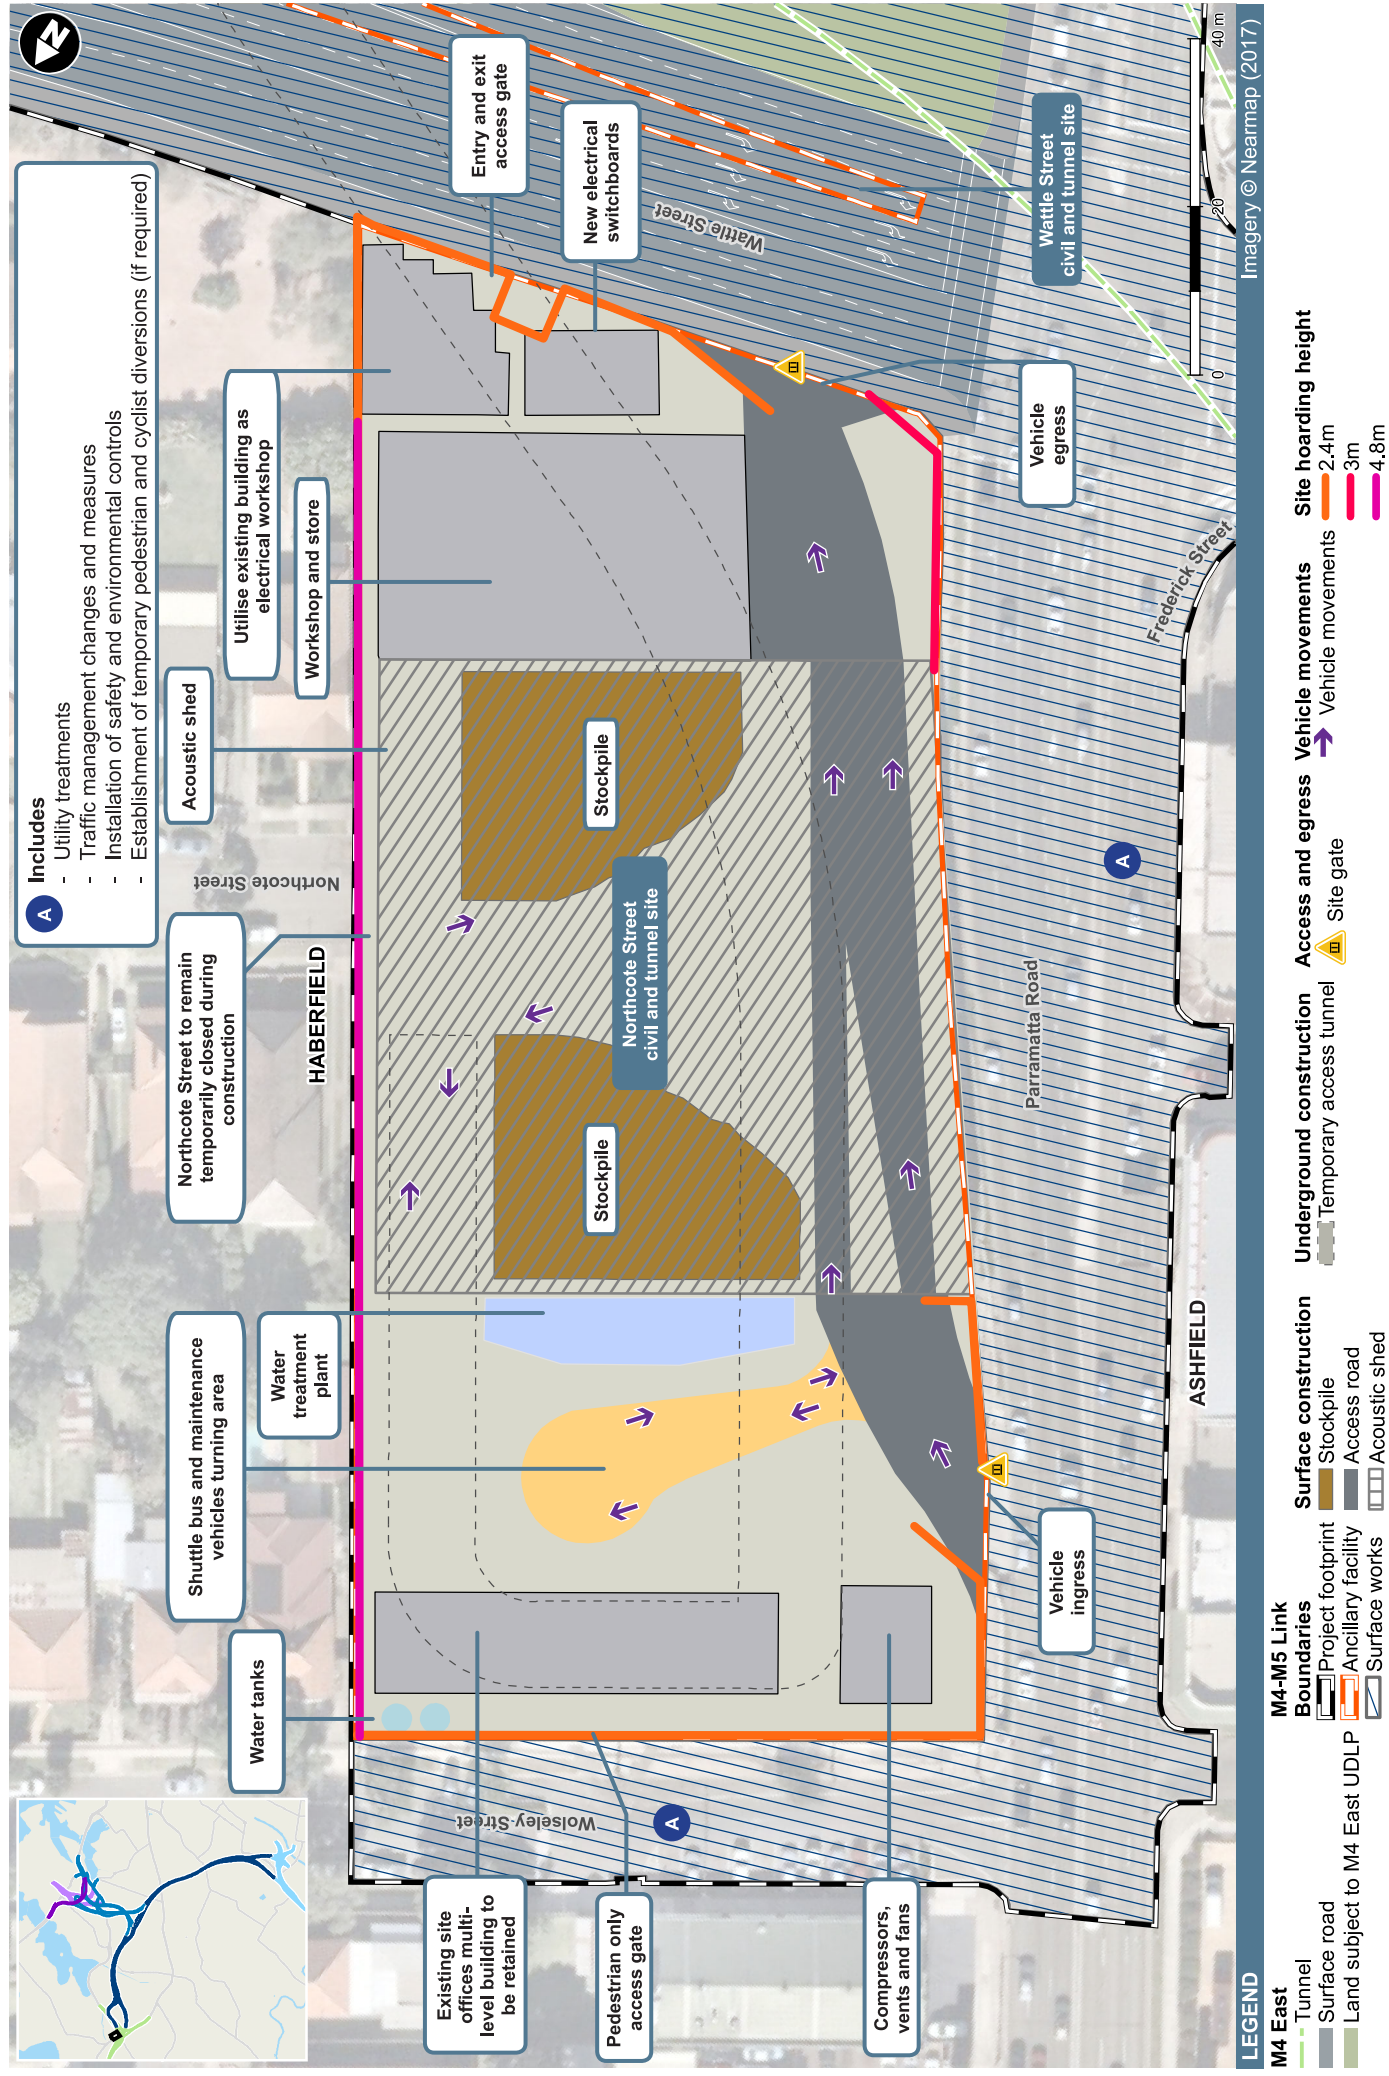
Indicative Northcote Street civil and tunnel site hoarding height
